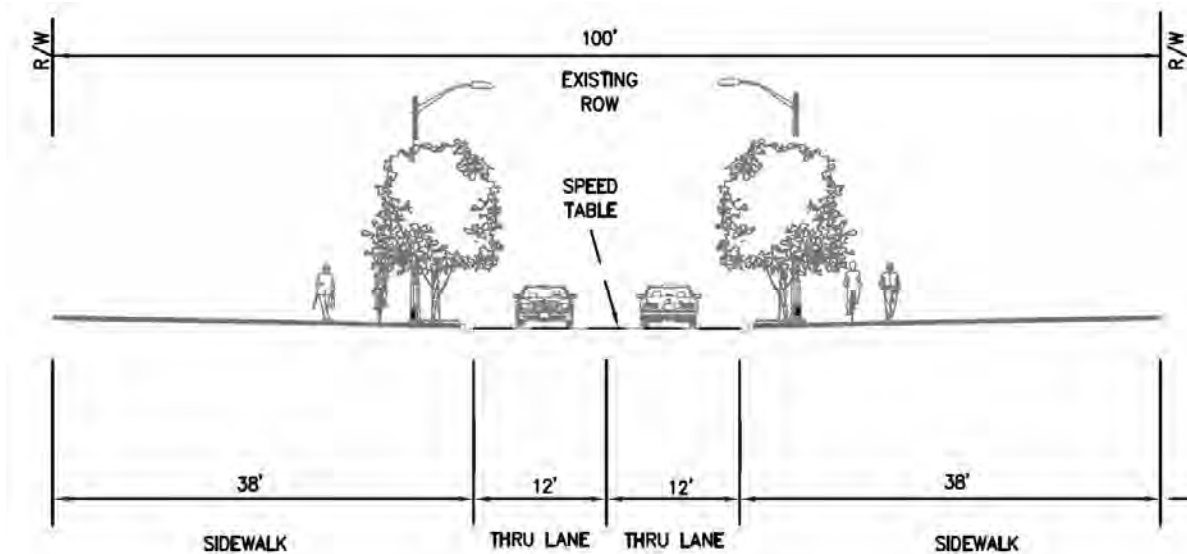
Proposed Cross Section, 3rd Avenue Without Diagonal Parking
